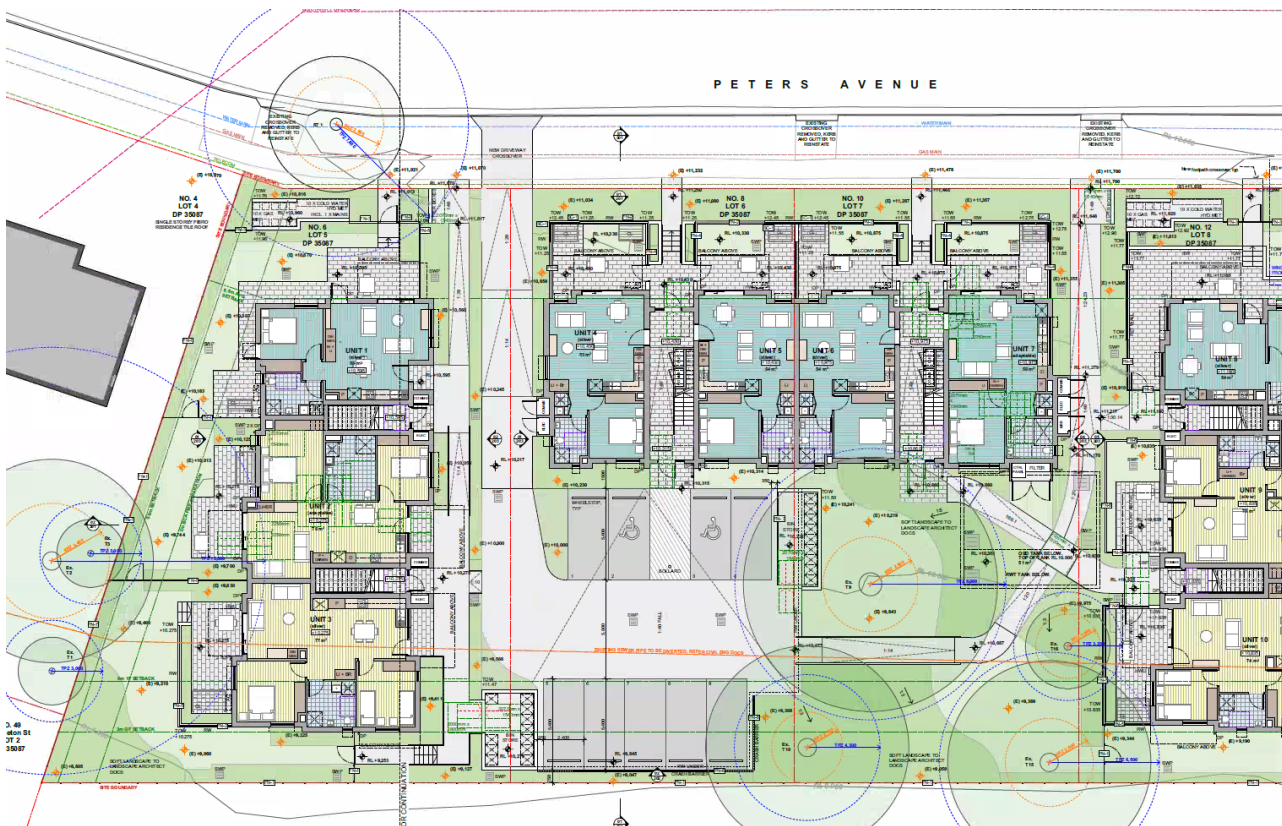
Extract from Architectural Plans – Ground Floor Plan (north) (Source: Architectural Plans, Sam Crawford Architects)
